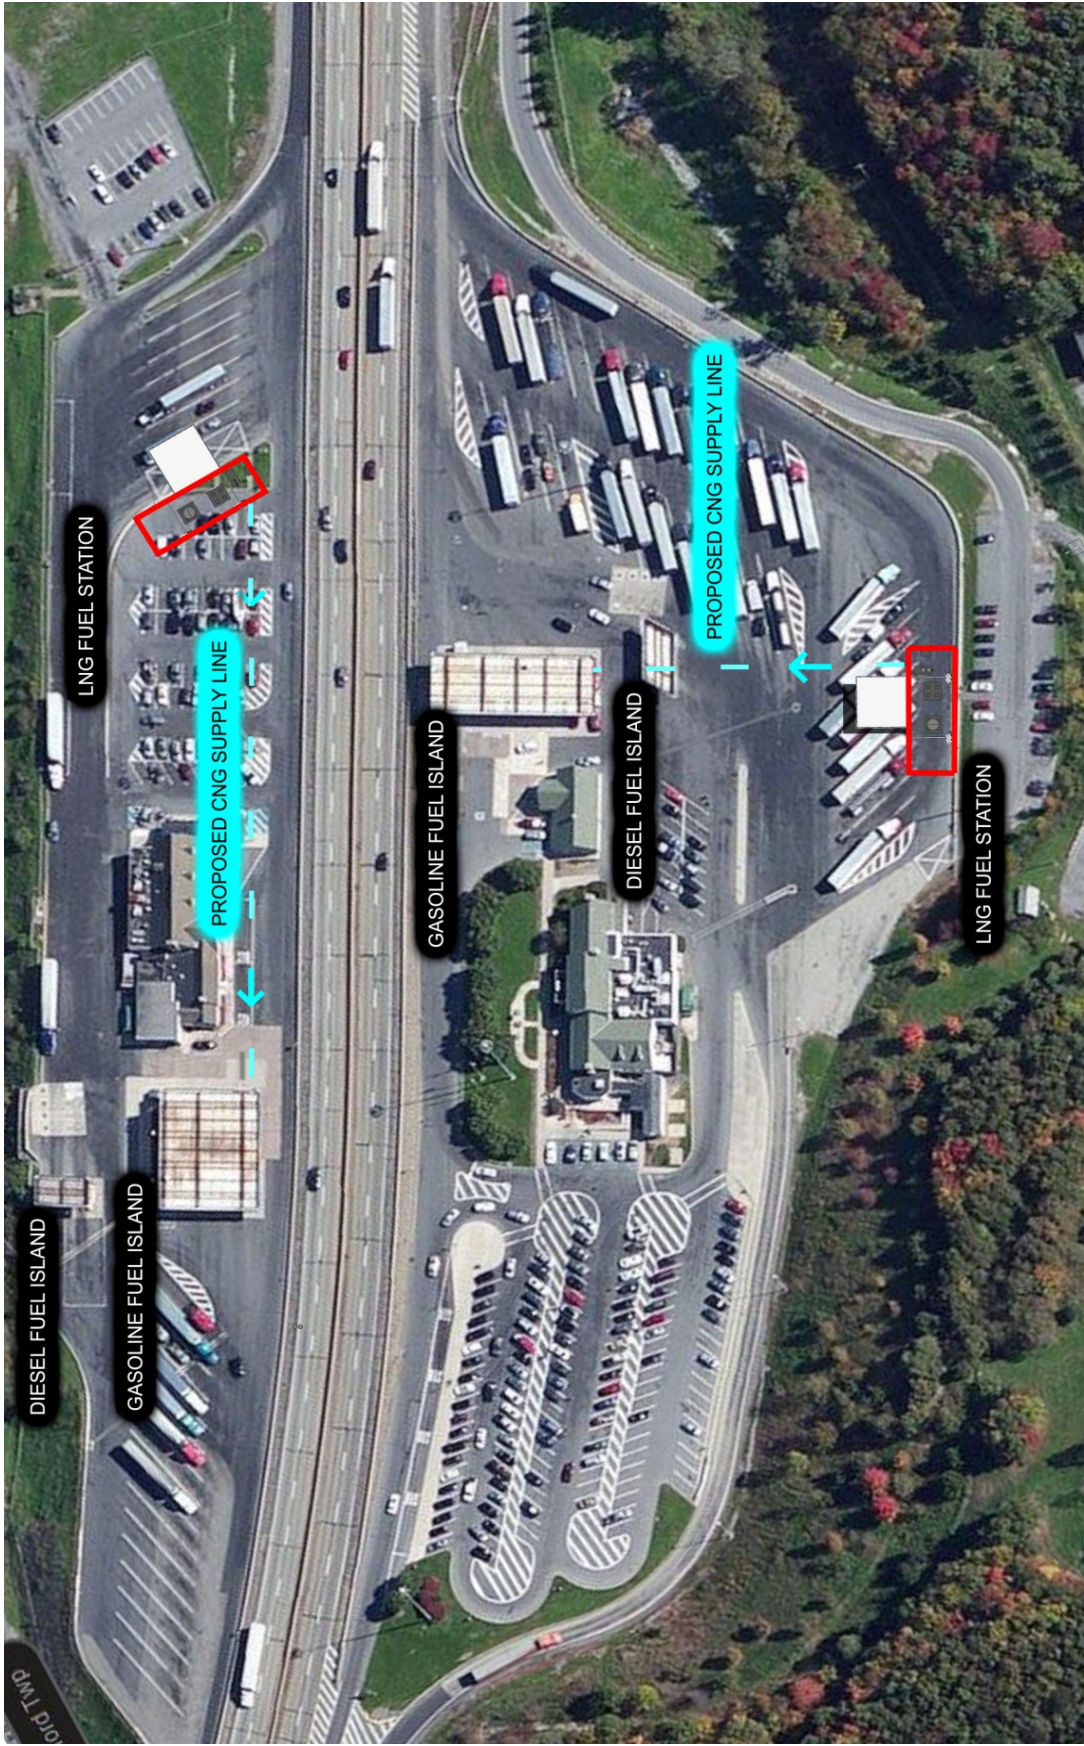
Conceptual plan for LNG fueling station installation at the North and South Midway service plazas
